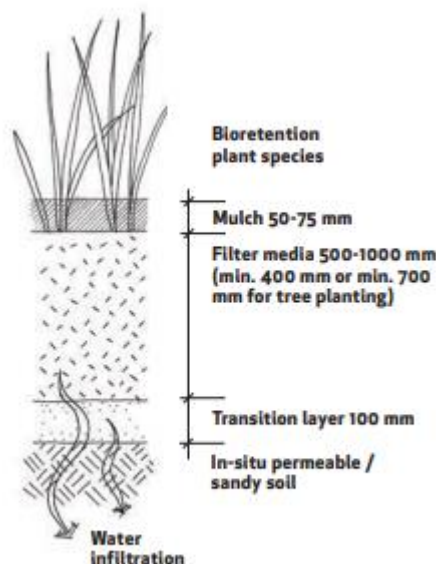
Cross Section of Bio-Retention Basin with a Pipe less Drainage Zone
